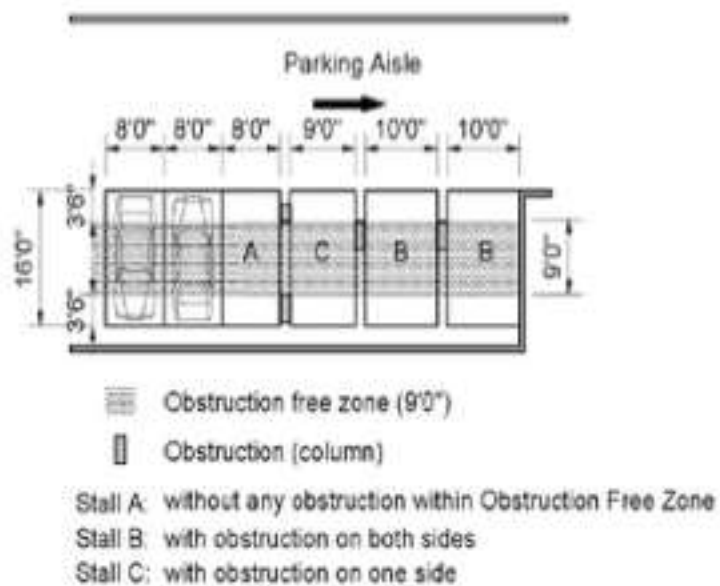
Places to maintain obstruction free zones and parking stalls with adjacent obstructions (For parallel parking, where a car cannot be parked by reversing, the length of stall shall be 24'.)
